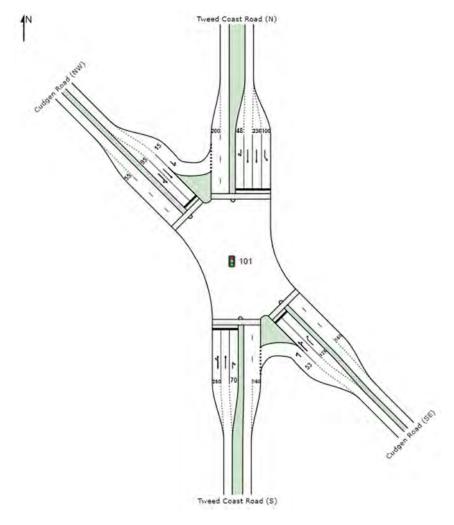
Tweed Coast Road/ Cudgen Road SIDRA Intersection Layout – Upgrade 2 Source: Bitzios
